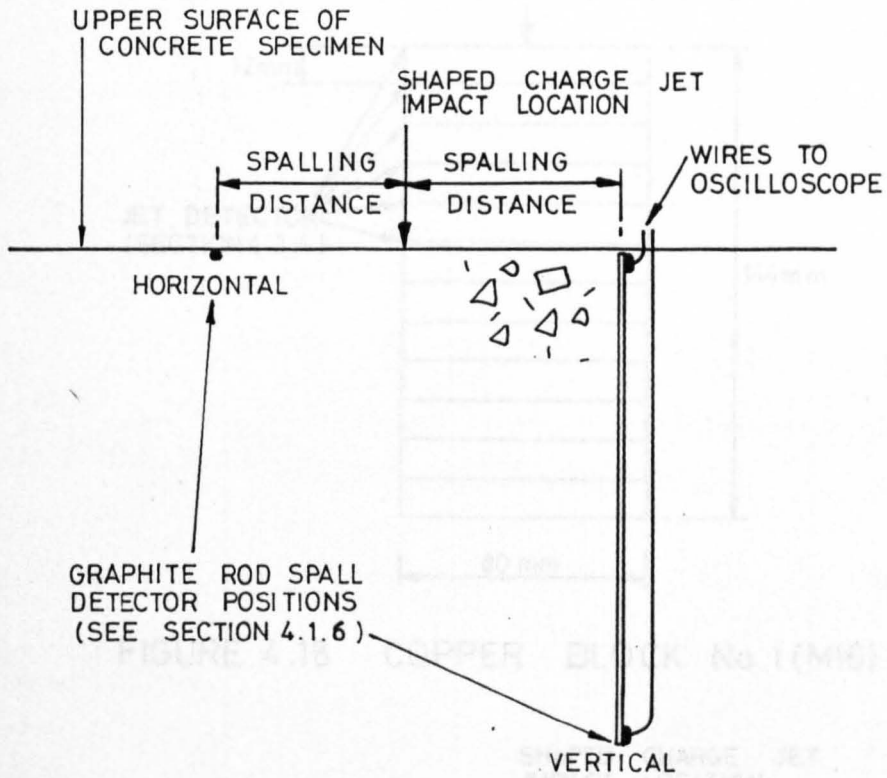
LOCATIONS OF GRAPHITE ROD SPALL DETECTORS BURIED IN CONCRETE TEST SPECIMENS
